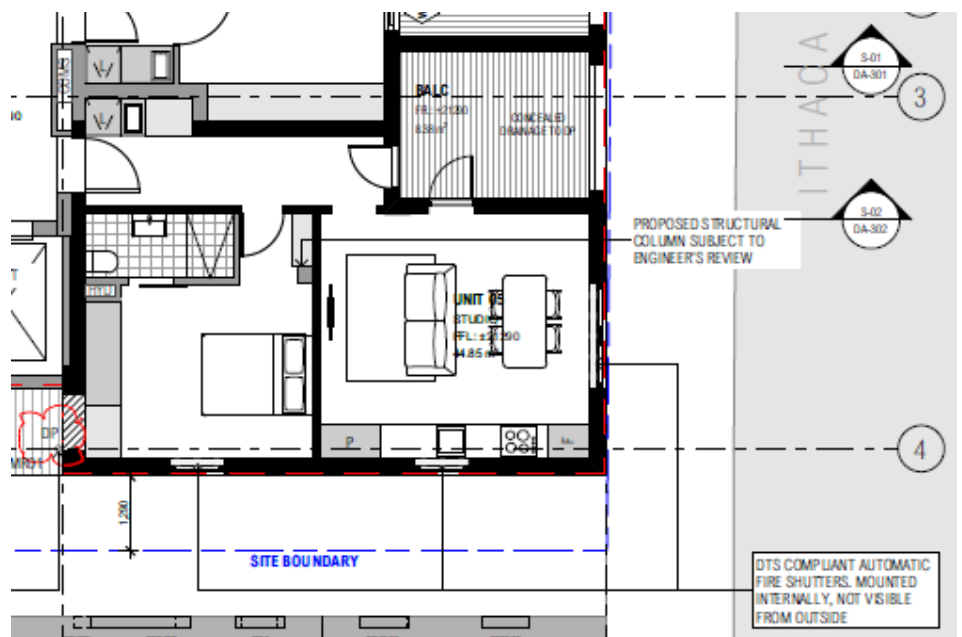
Extract of Unit 05 Layout (Drawing DA-103, Rev. F)
